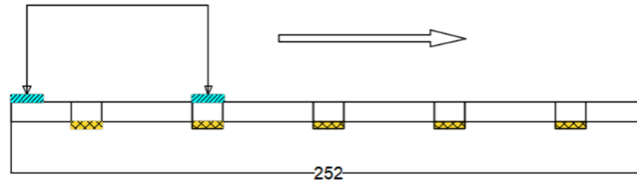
The placement of HL-93 load on deck slab with 4-ft girder spacing (first combination)
